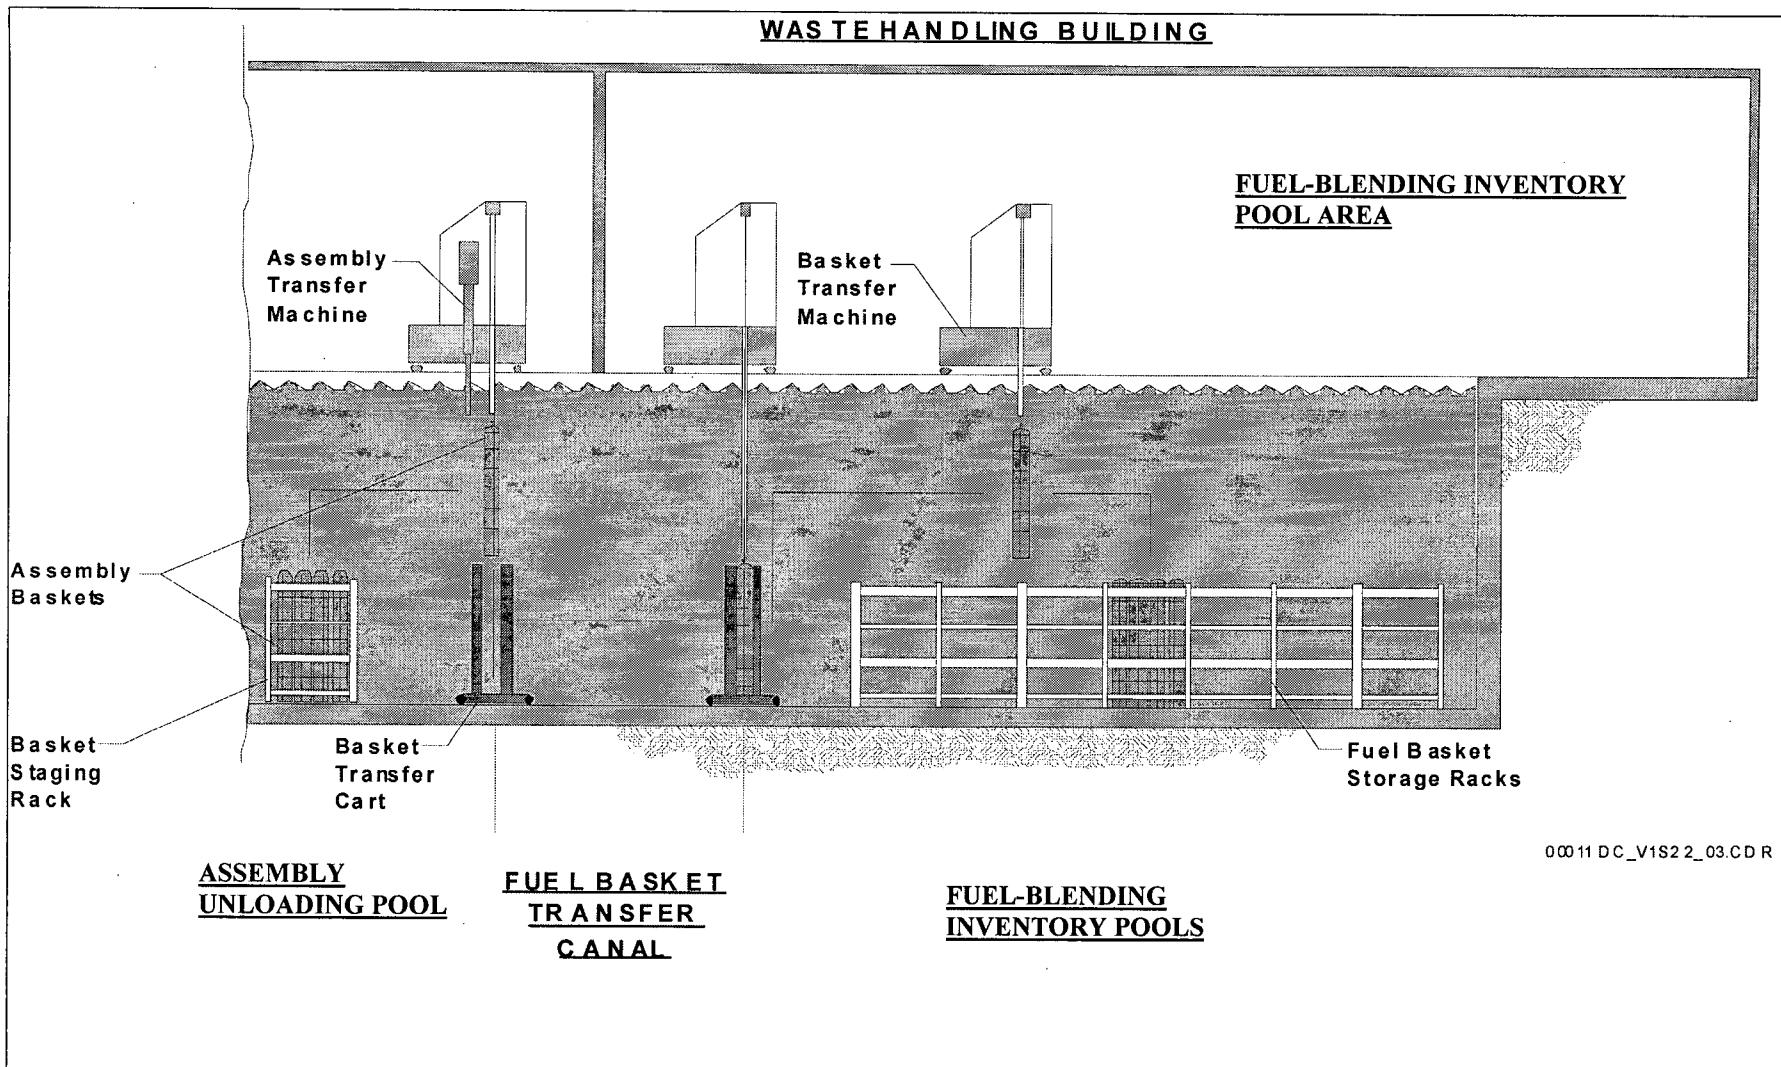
Assembly Transfer System Fuel-blending Inventory Pools Area Operations
